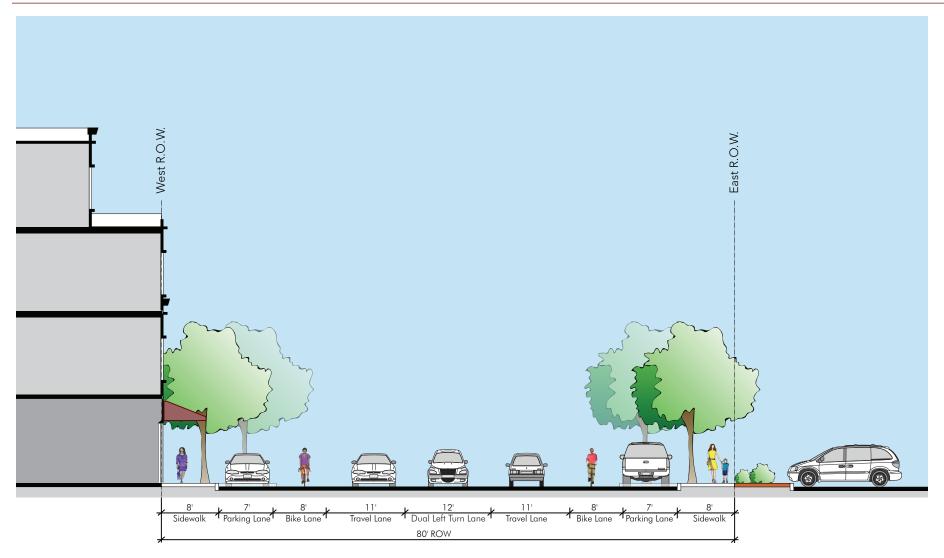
C: Highland Avenue Proposed Long-Term Street Section (Northbound View)
